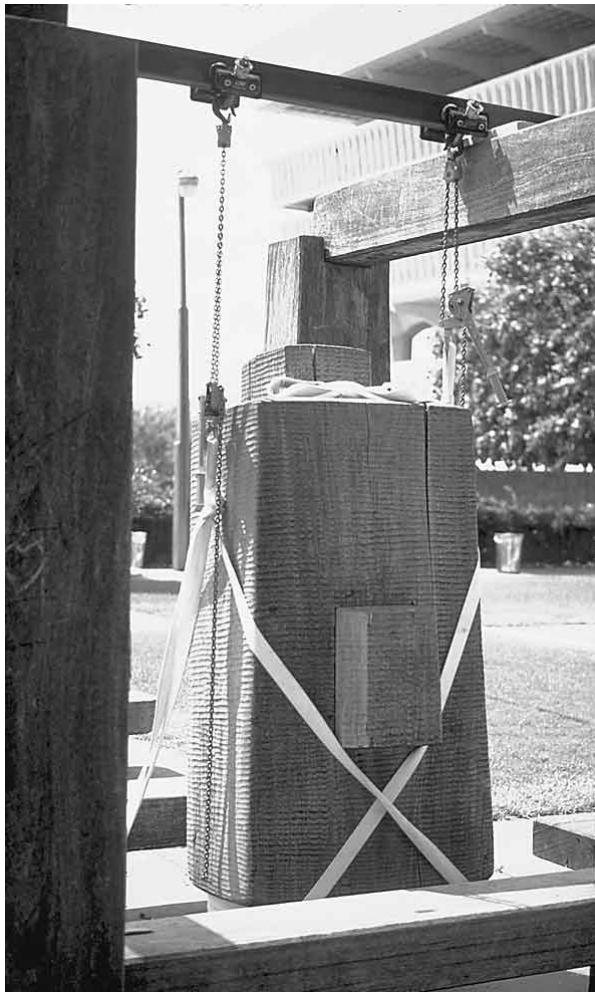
A large center block between arches (1 of 8) showing the lifting equipment.
